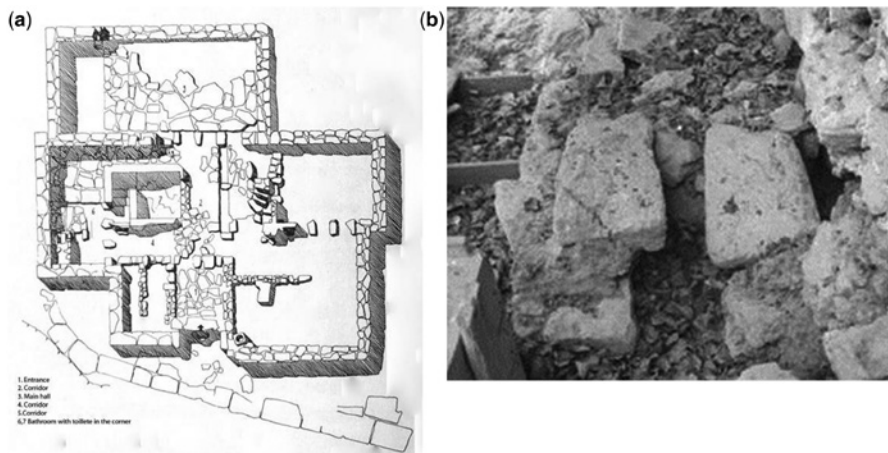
Toilet in the House Da, Malia: (a) Layout of the house (adapted from Graham, 1984) and (b) a recent photo of toilet (no 6 in the layout plan) (with permission of A. N. Angelakis).
